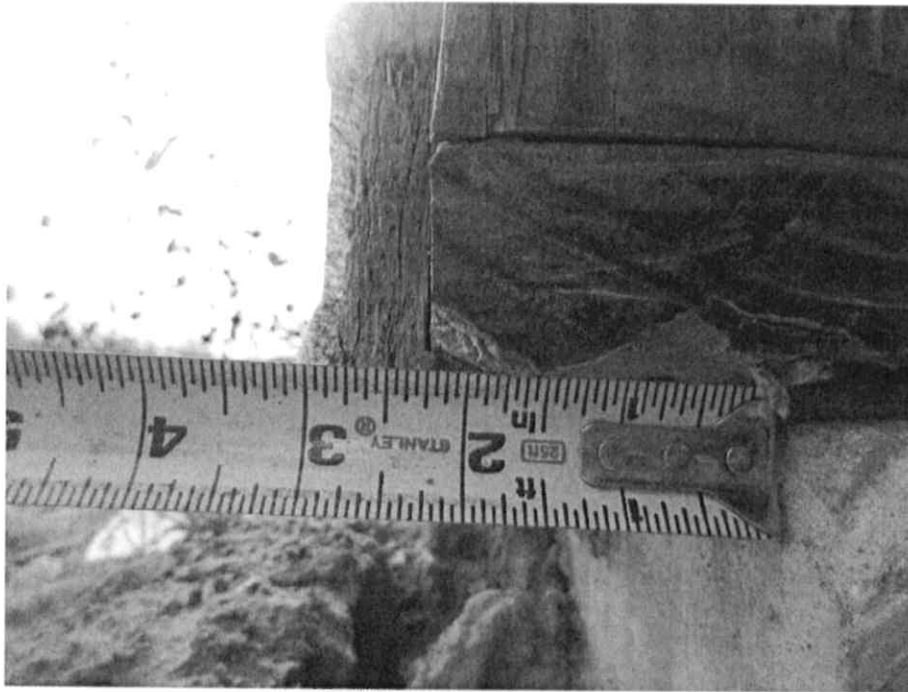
View of approximate 2.25 inch overhang of east exterior wall sill plate off the outside face of concrete foundation wall.
